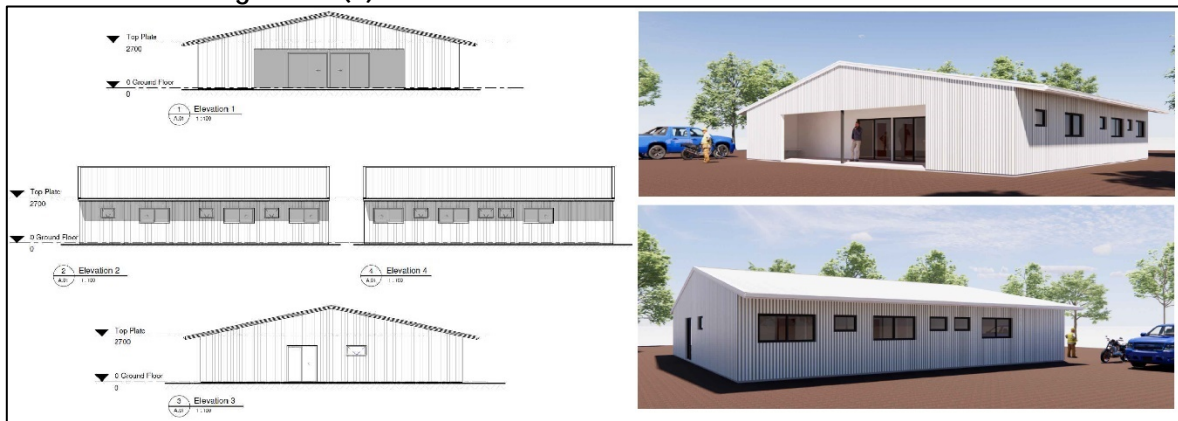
(d) – Workforce Accommodation Elevation Plans
